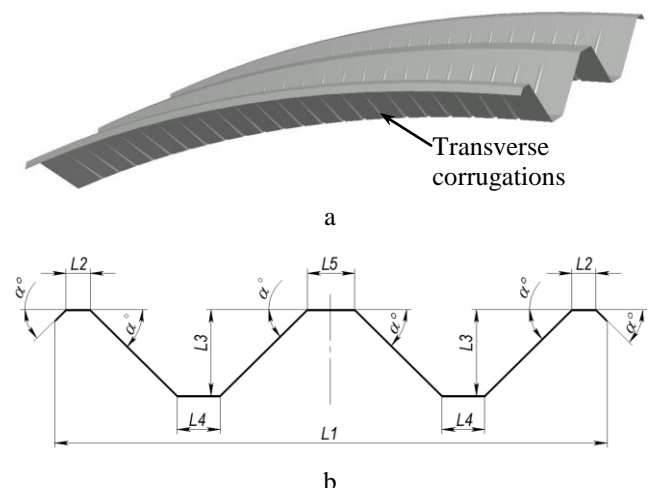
General view of the corrugated steel panel (a) and dimensions of the cross-section (b)
